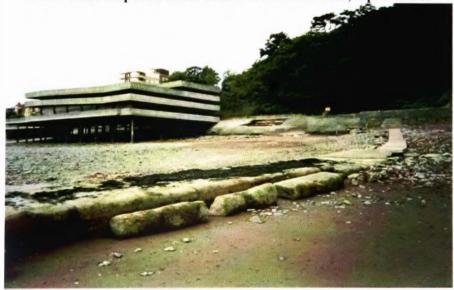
Damaged sea defences and concrete culvert, April 1998.
